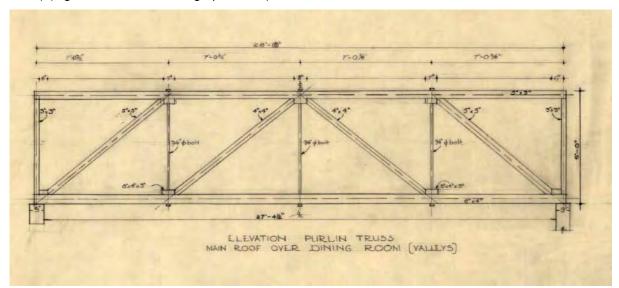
Detail of exposed purlin truss system (originally planned to be the dining hall ceiling, then the lounge in final plans, and later conference room) 1950 (NAA #7689987)
